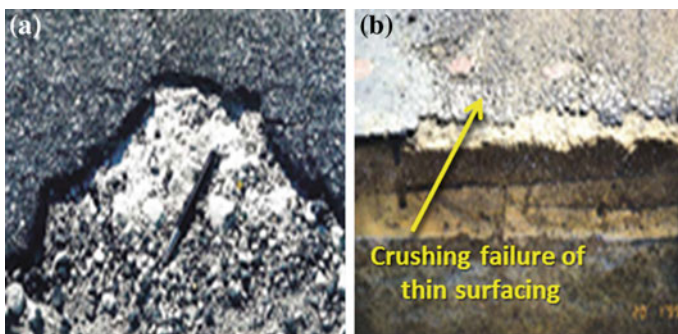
Crushing failure resulting in a pothole of a cemented base pavement in (a), and failure in top of a lightly cemented base layer—after HVS testing in (b)
